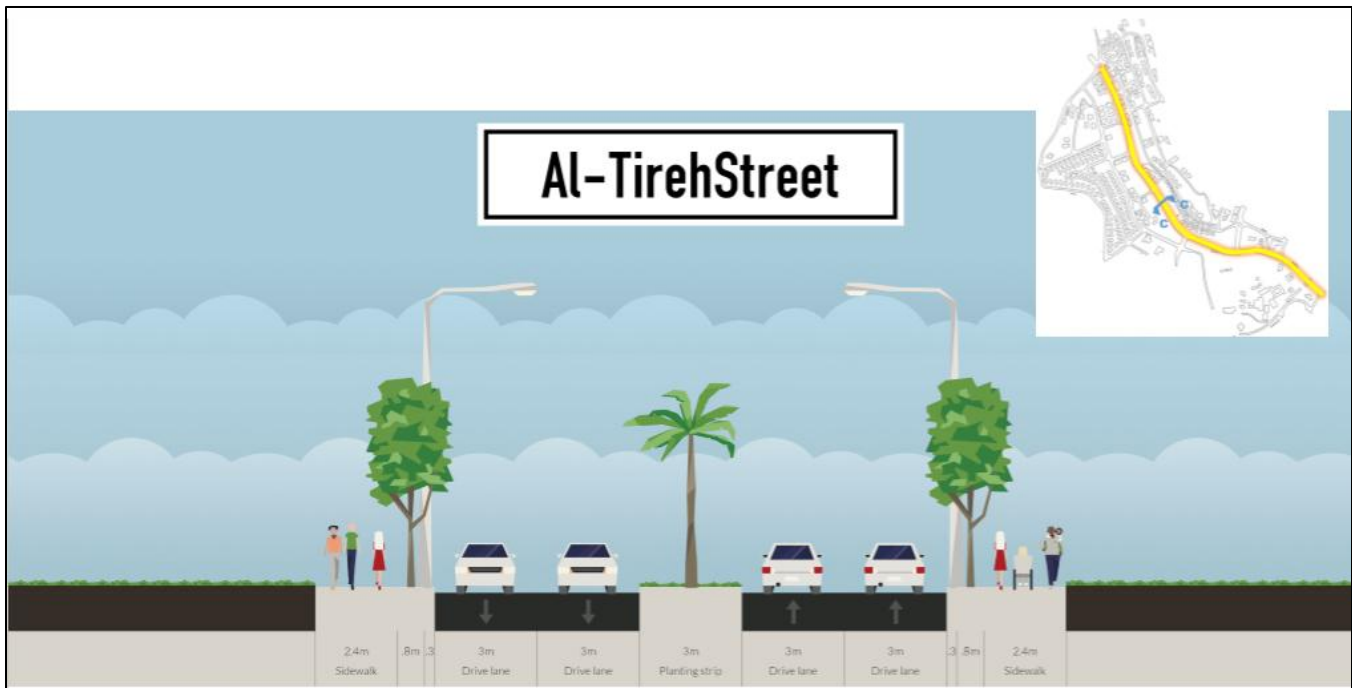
MAIN STREET SECTION WITOUT BUILDINGS ON SIDES WITH WIDER SIDEWALKS
